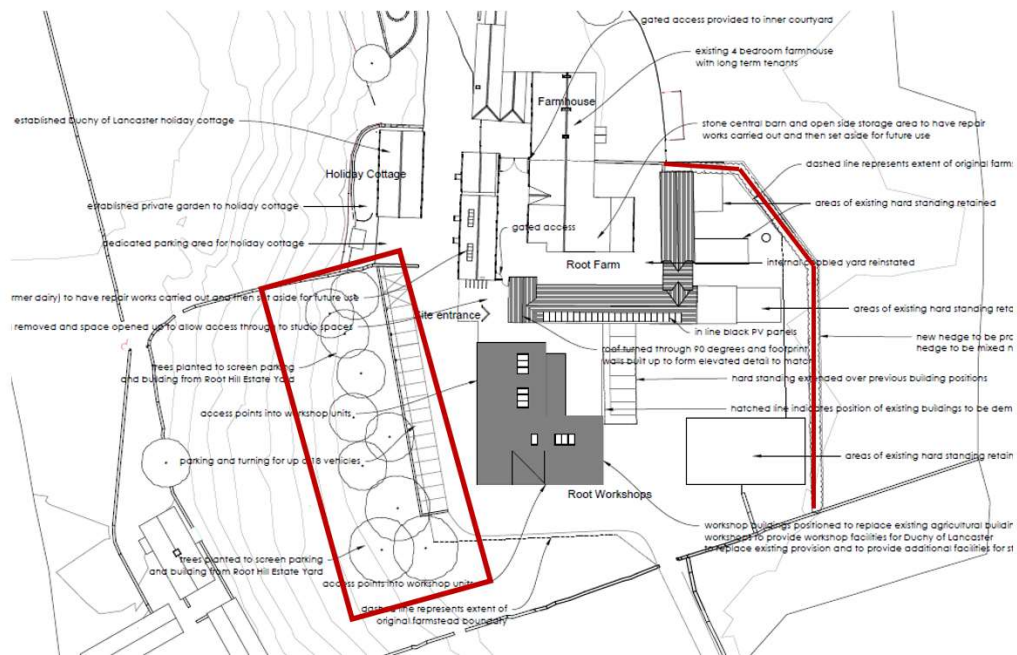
New hedgerow (c.100m) and new tree planting highlighted on site plan
